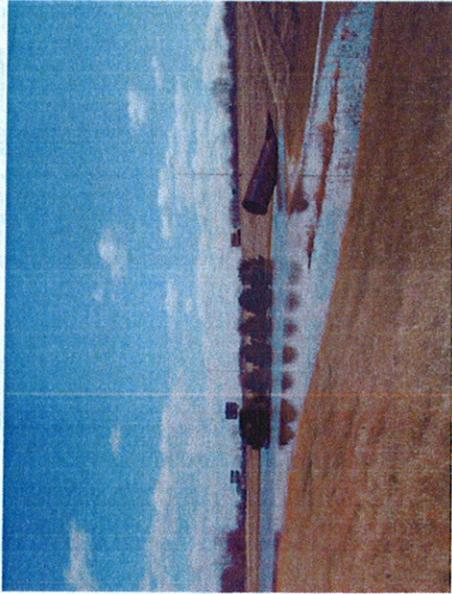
Facing southeast at inlet before pipe was cut and dropped.
